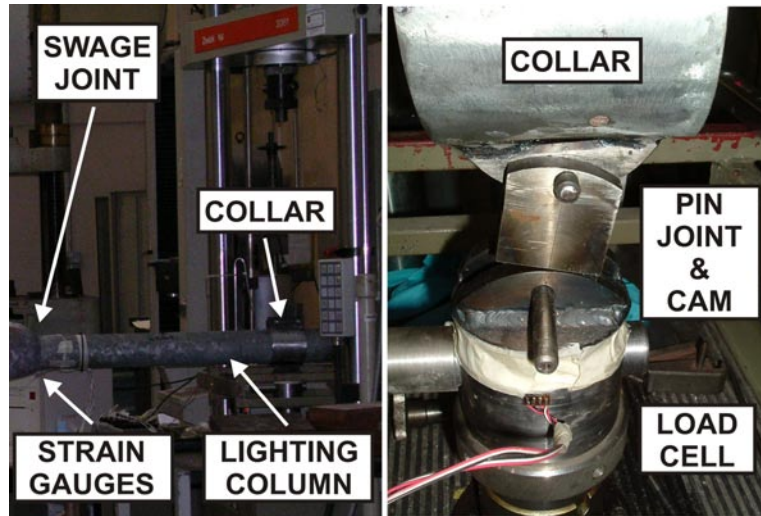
Test set-up showing servo-hydraulic test machine and loading arrangement.
